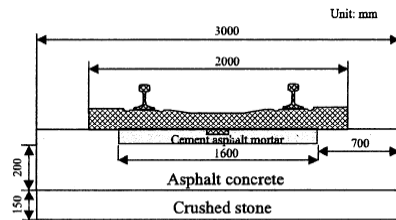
Cross section of the improved solid bed track on asphalt pavement
